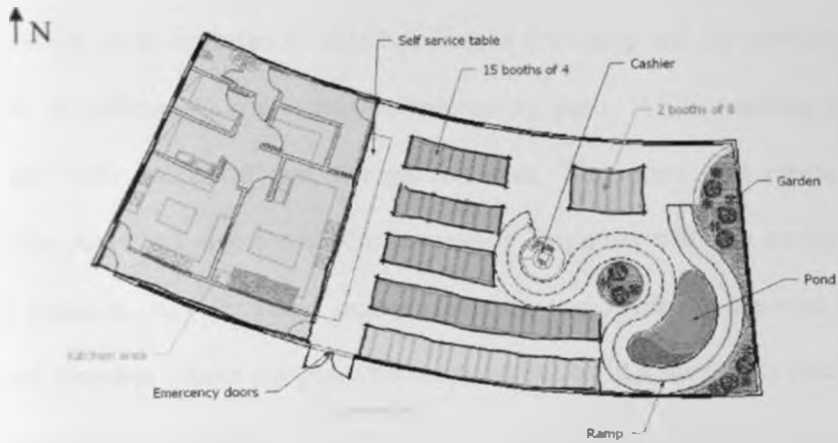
19 – Restaurant building ground floor layout plan. Source: Author, 2013.
